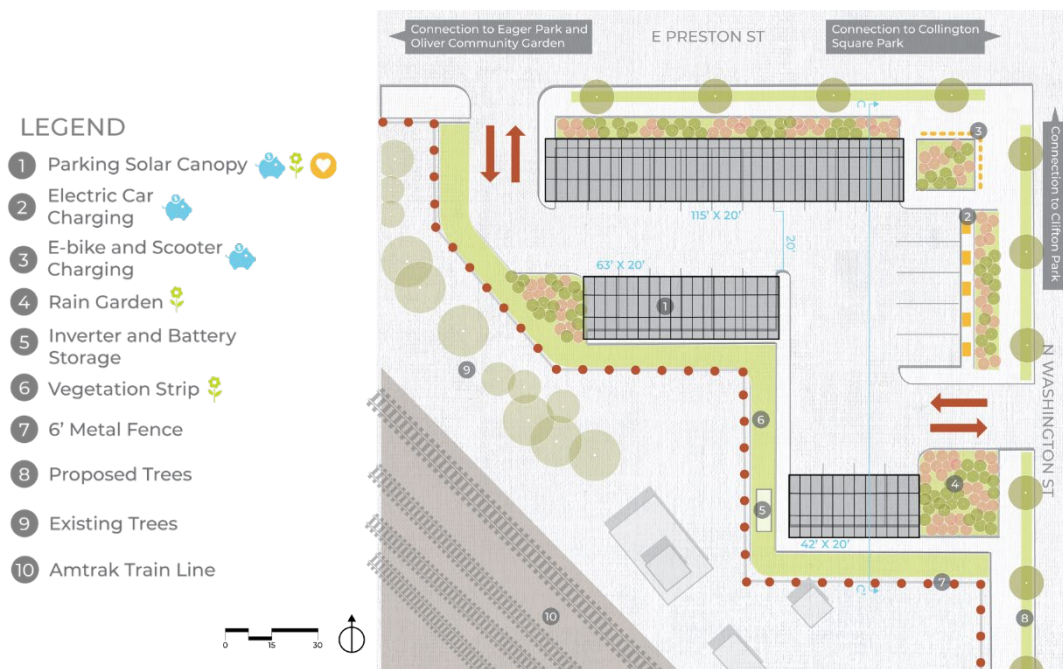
Site plan of the proposed Solar Parking and Charging Hub.
